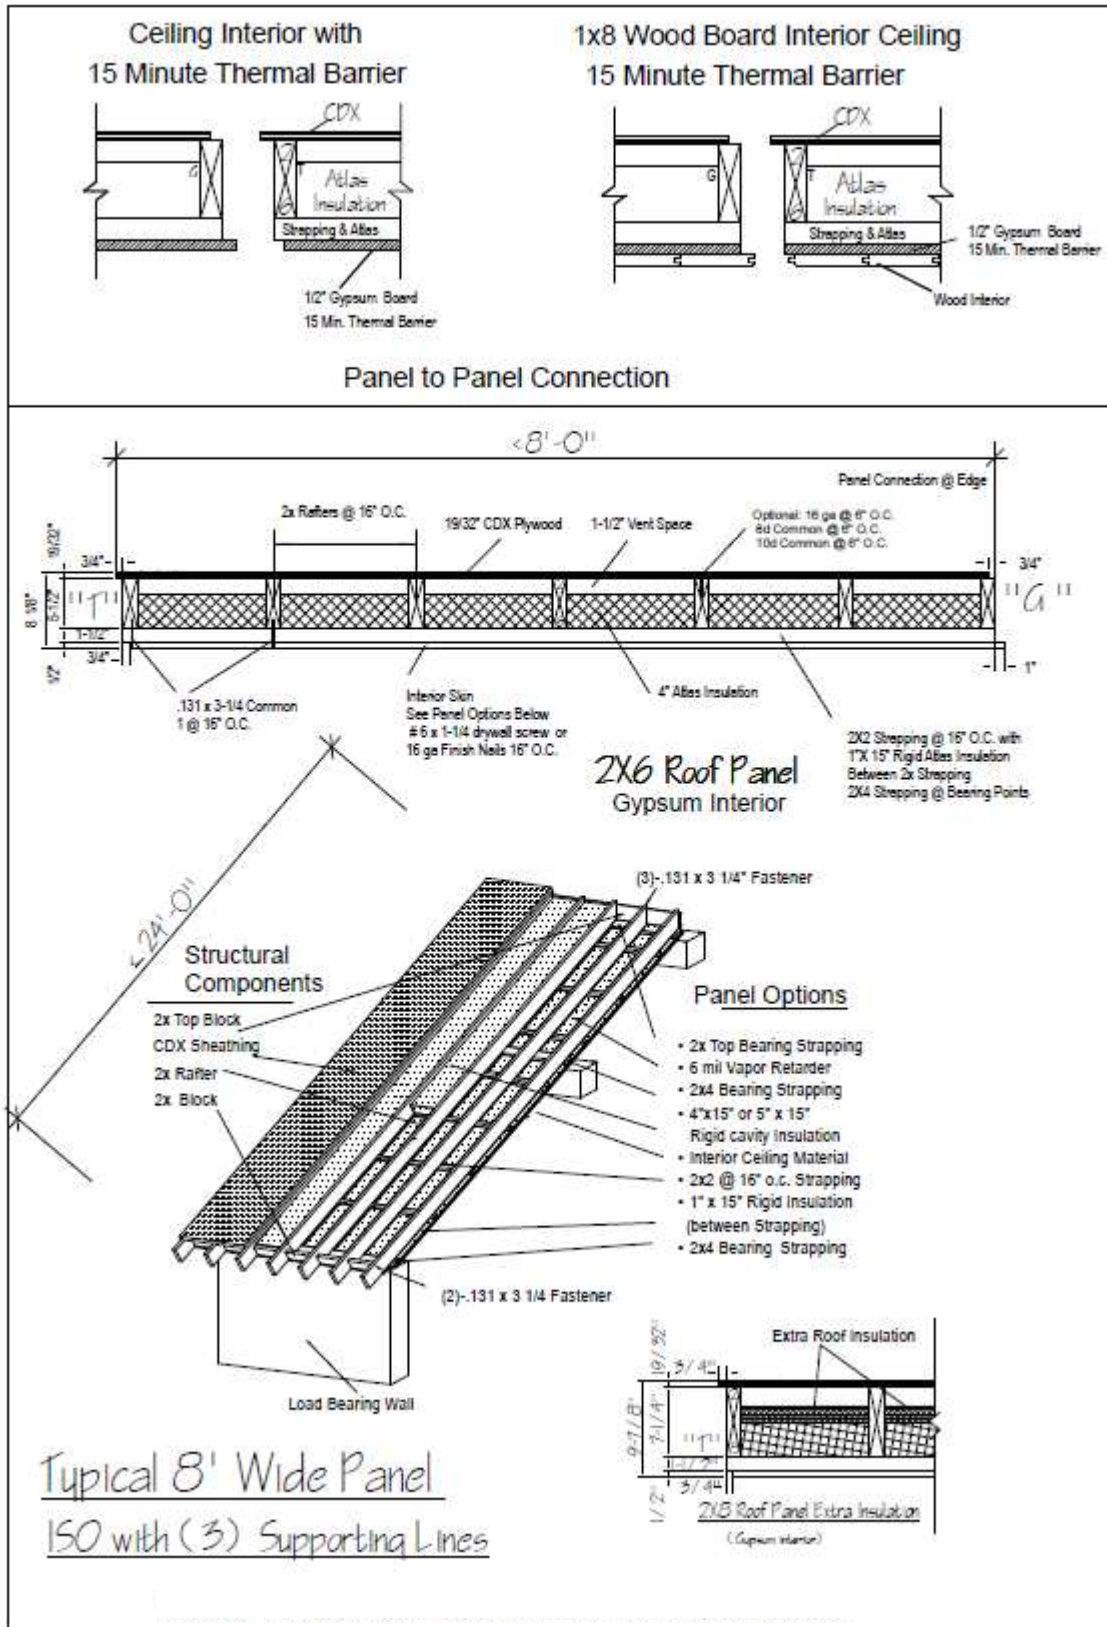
TRUE ROOF PANELS INSTALLATION DETAILS
